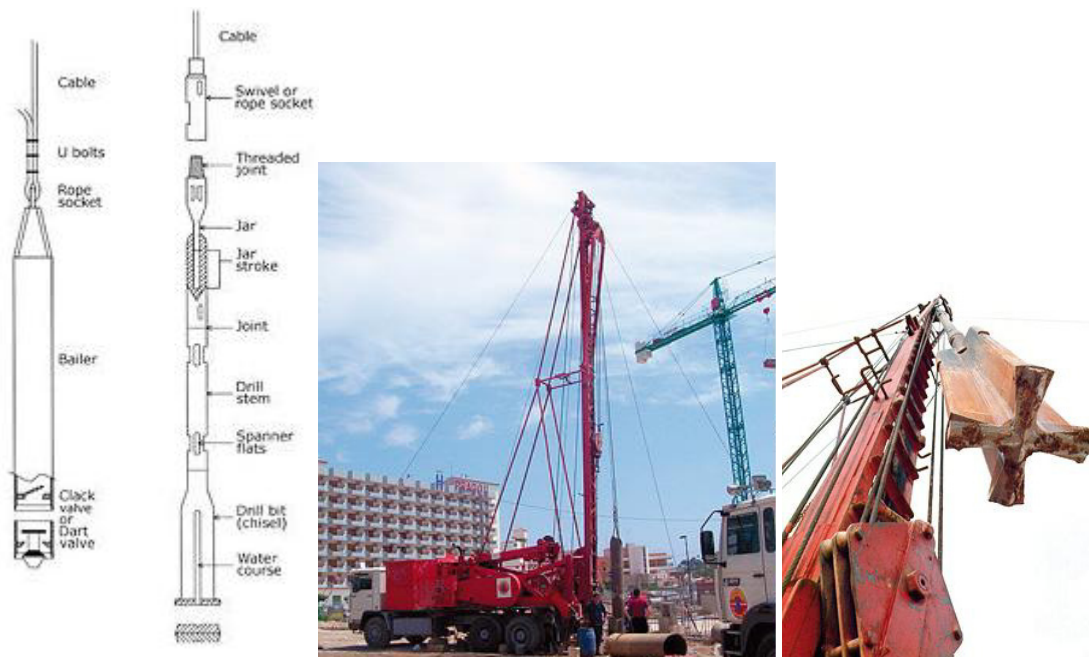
Basic scheme (left) and images (middle and right) of cable tool drilling.
